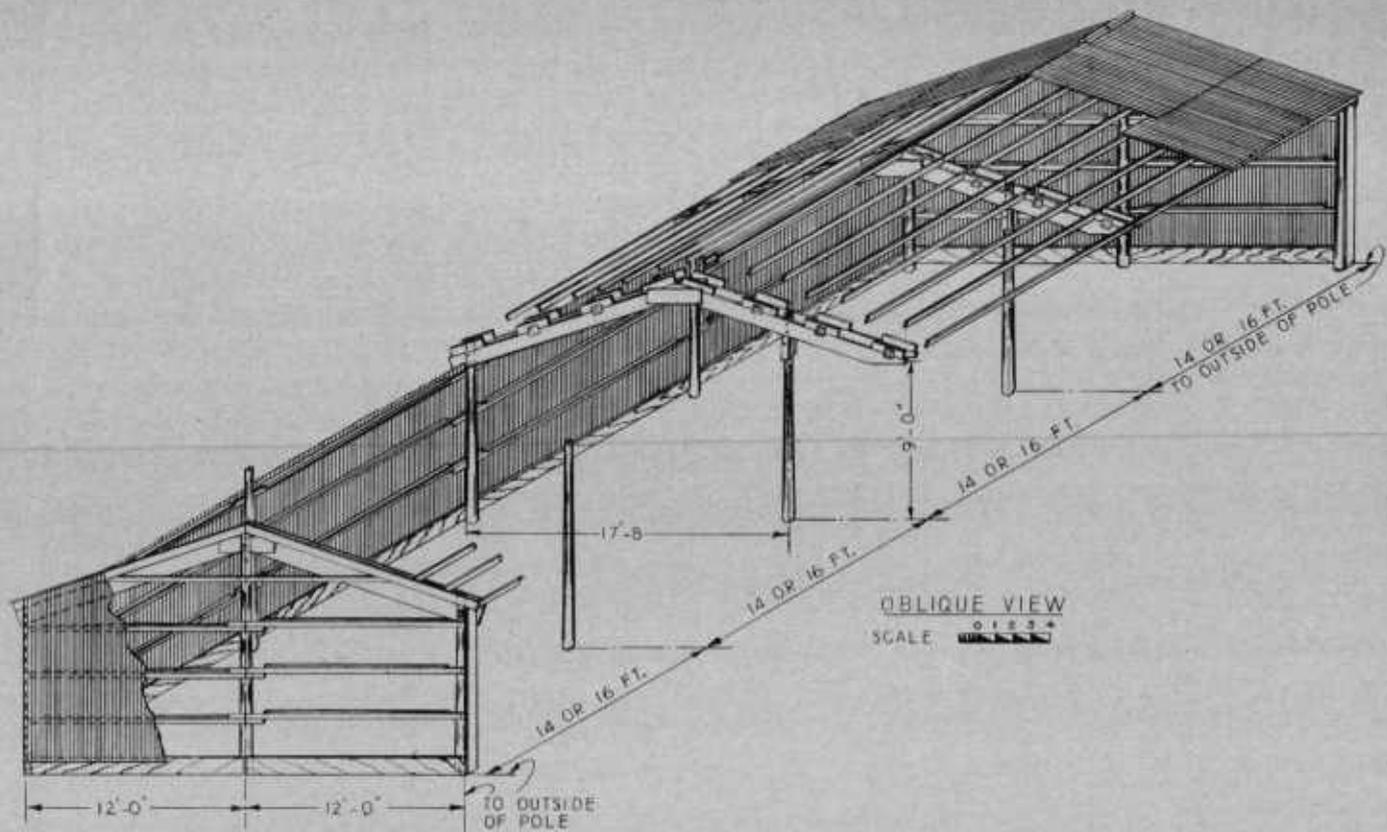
The building on the cover and the one shown above utilize cantilever 2 x 12 rafters with a 7-foot overhang and a 17-foot span between poles. The peak is midway between total span of rafters. This gives a 24-foot-wide building without using trusses, thus reducing material costs.
